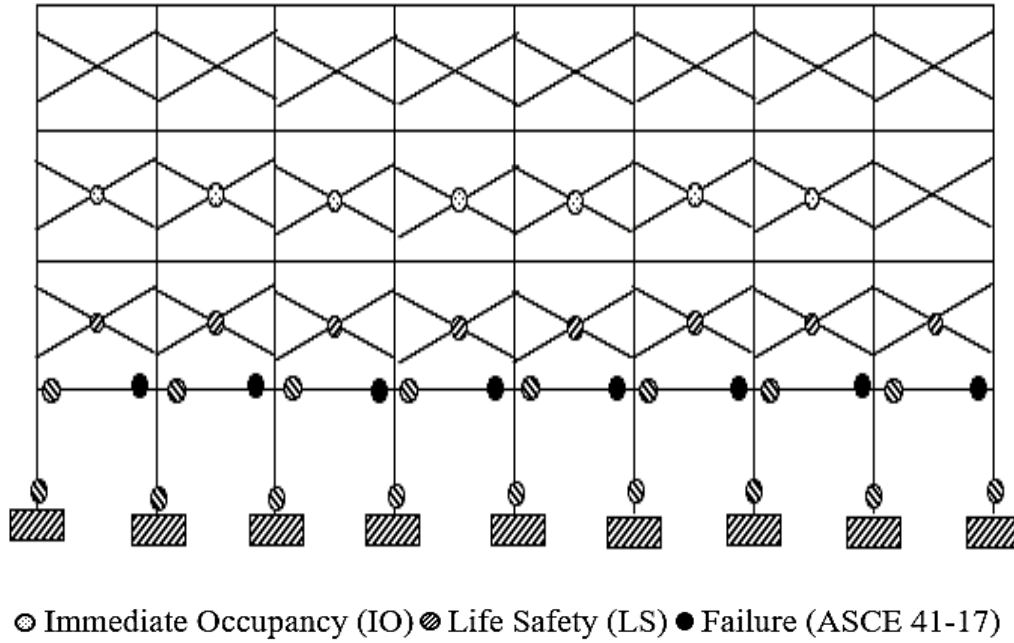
Typical failure mechanism at critical frame of mid-rise OOGS_NOSC building
